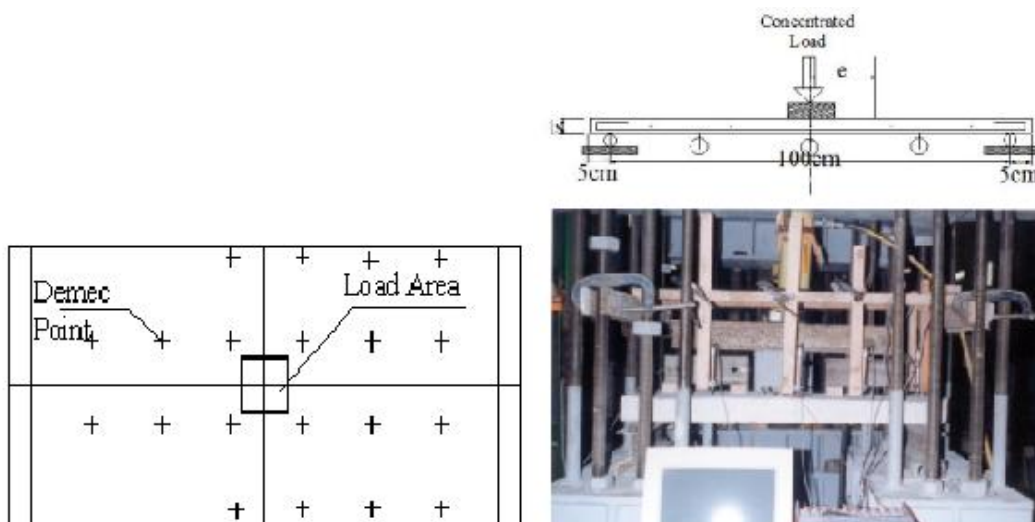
Reinforcement and Details of Slab Specimens.
